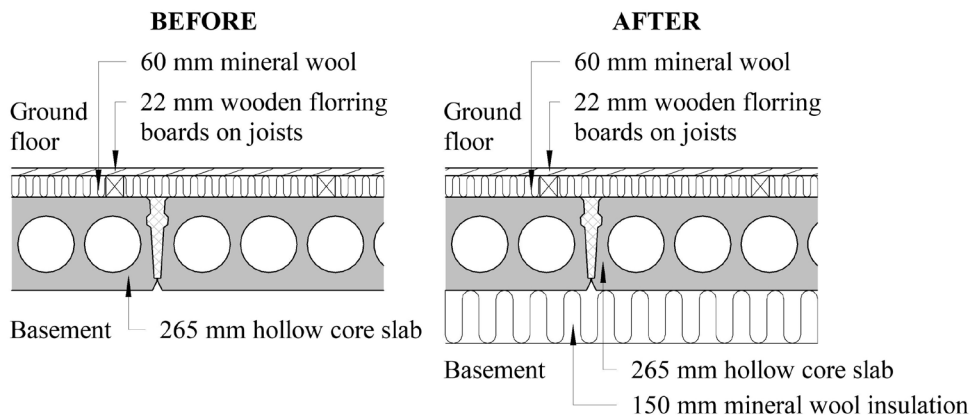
Cross-section view, floor construction towards basement, initial and retrofitted state.
